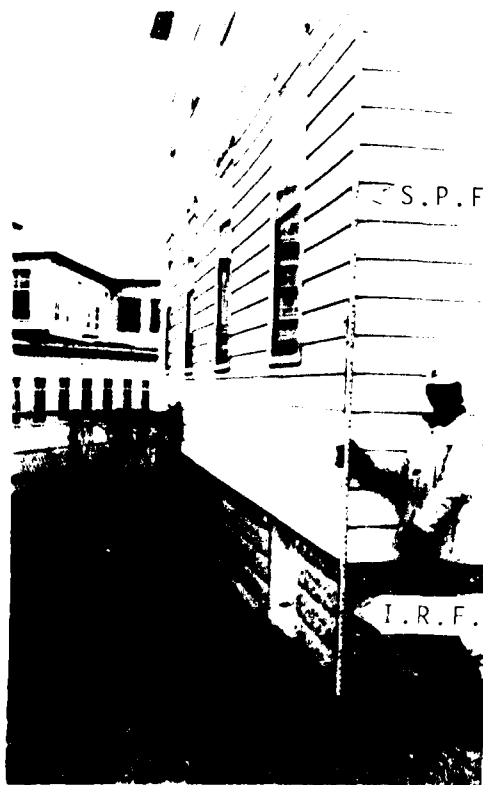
Future flood heights on downstream side of Genesee Street at corner of building adjacent to Nine-mile Creek (stream mile 7.20) in Camillus. Photo taken April, 1975.
